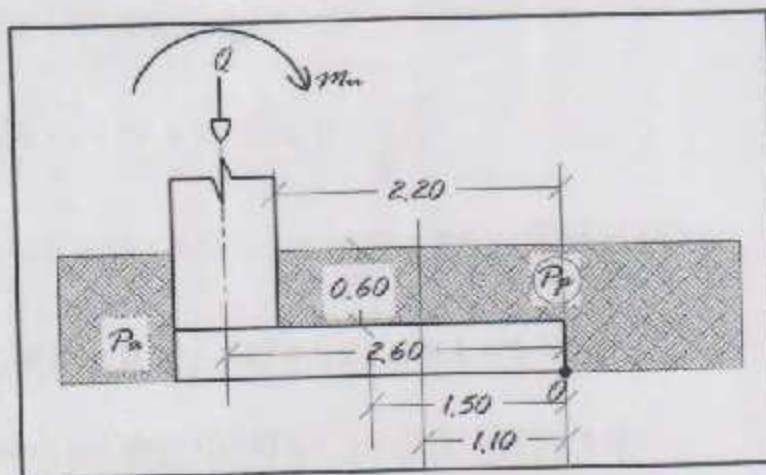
Forces for Check against overturning failure - Exterior frame footing
